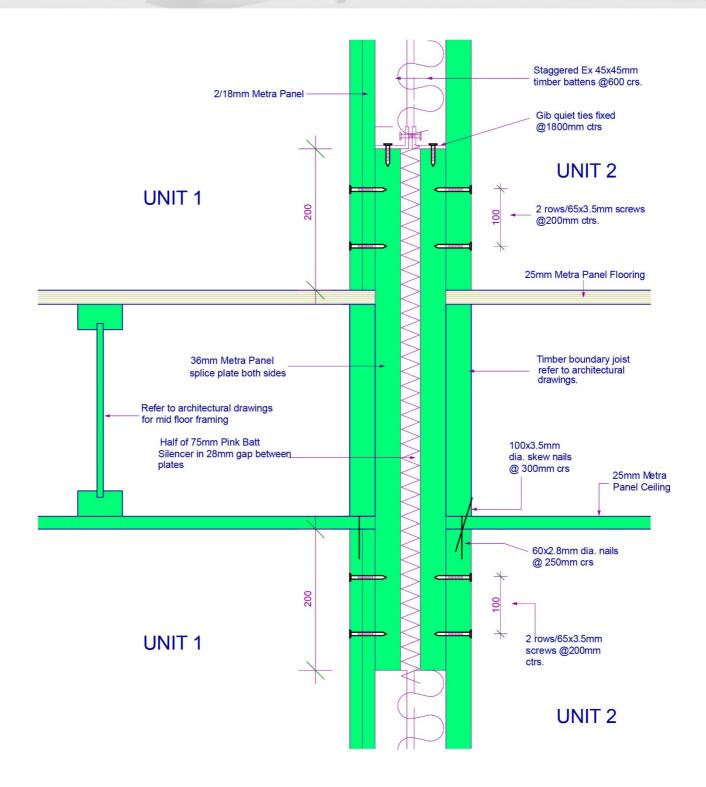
172mm/STC61 IT wall midfloor/double horizontal cleat
